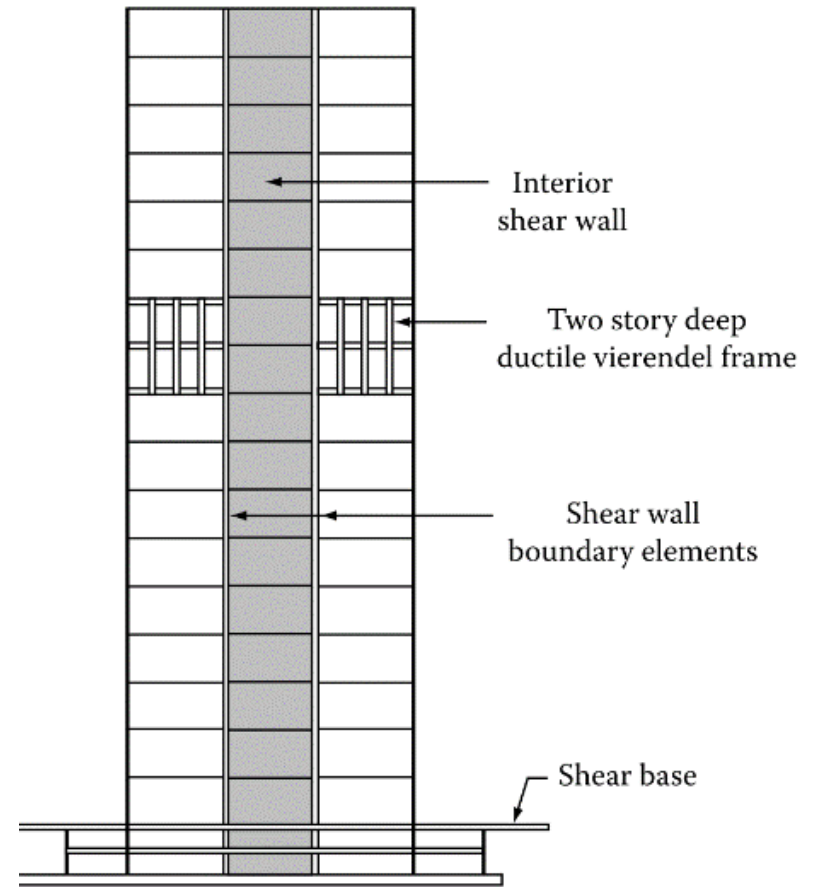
Vierendeel frames acting as outrigger and belt wall system.
